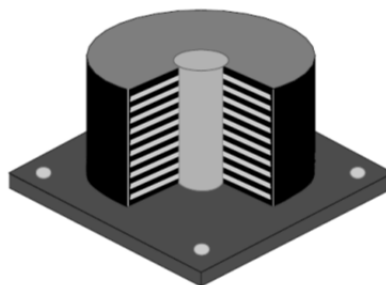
Elastomeric – Lead Rubber Bearing (LRB)
